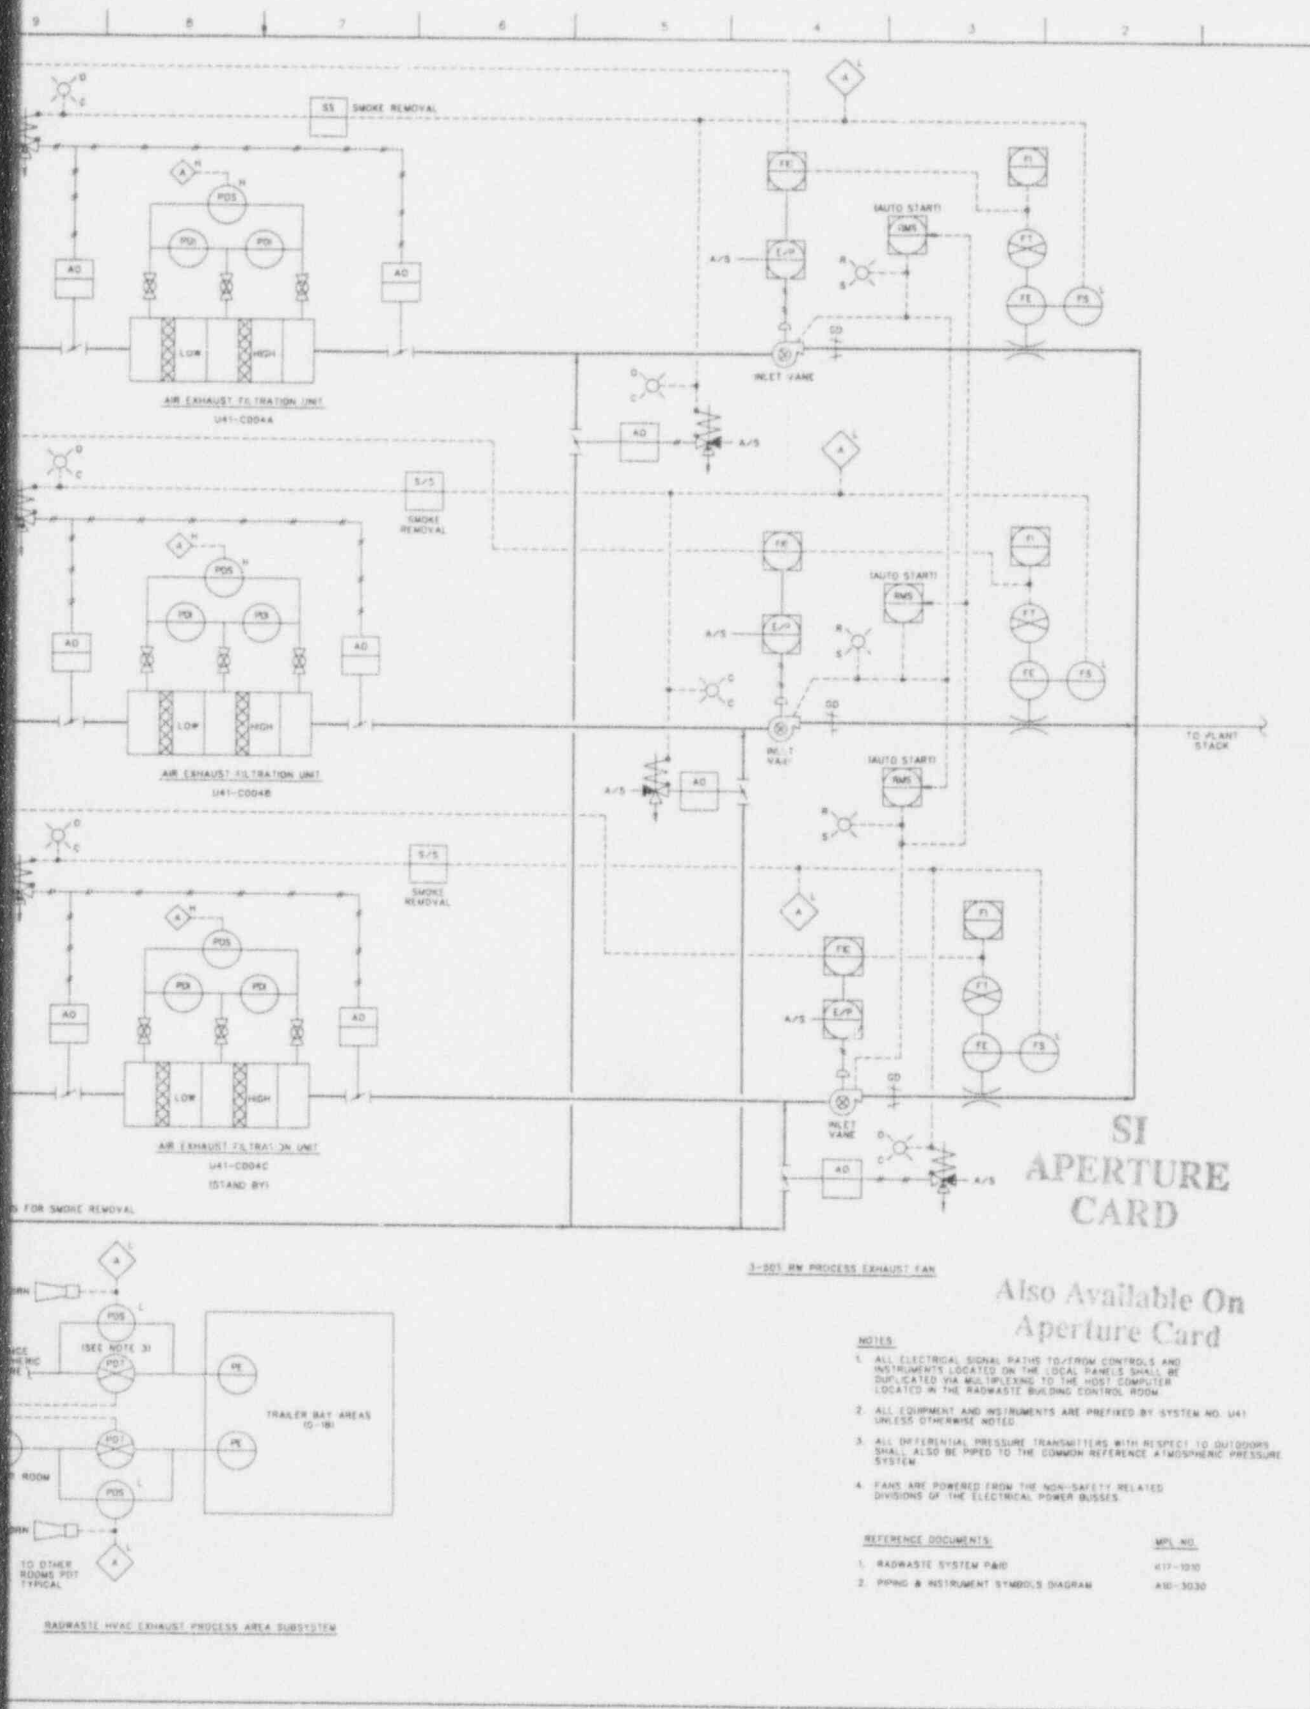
RADWASTE BUILDING HVAC, (Sheet 3 of 3)
